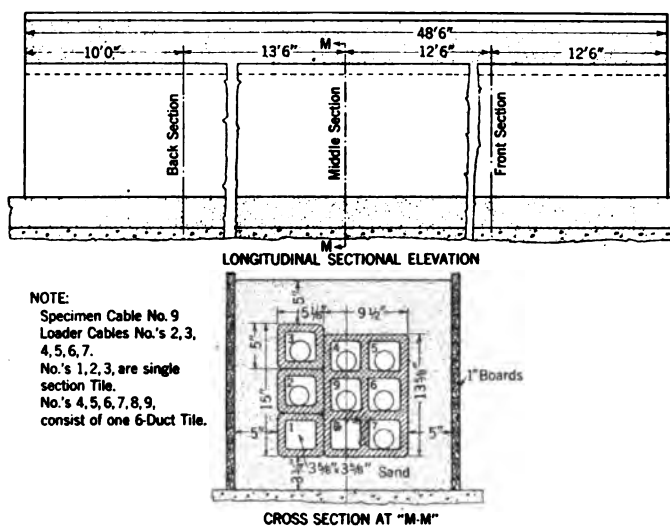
ARRANGEMENT OF DUCTS AND CABLES IN TEST
